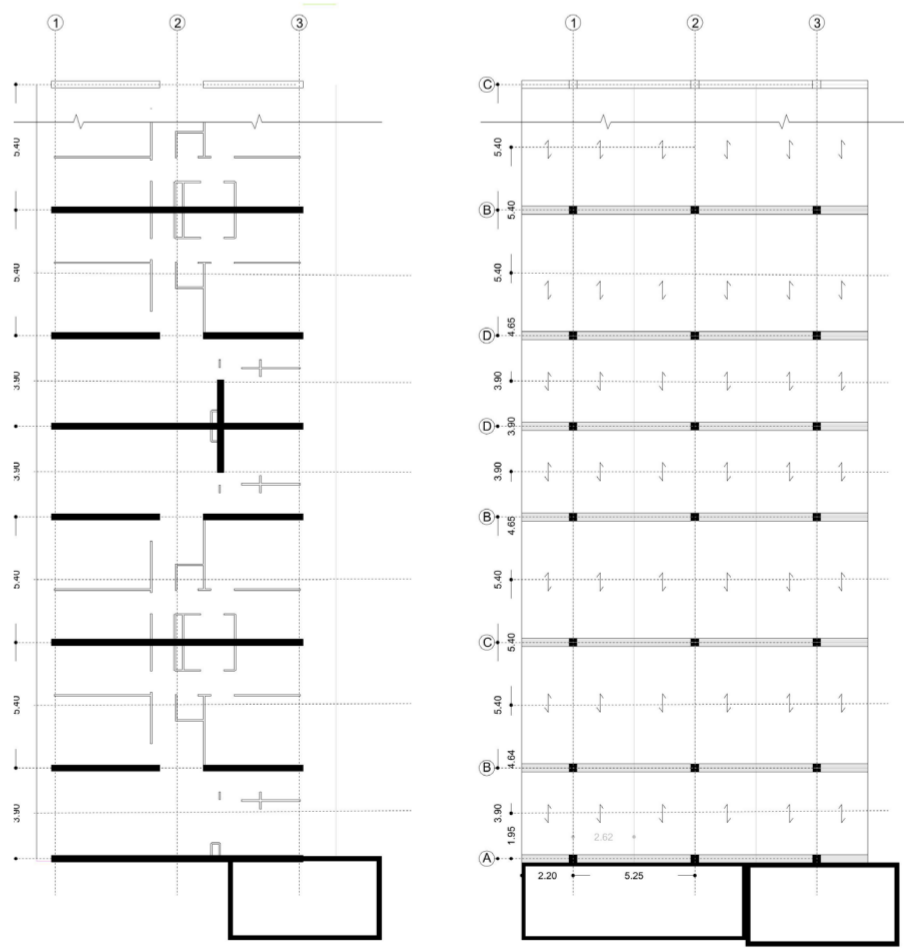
Image XX. To the left: Floor plan of the existing building with the existing grid. o the right: Proposed grid for the top up.
